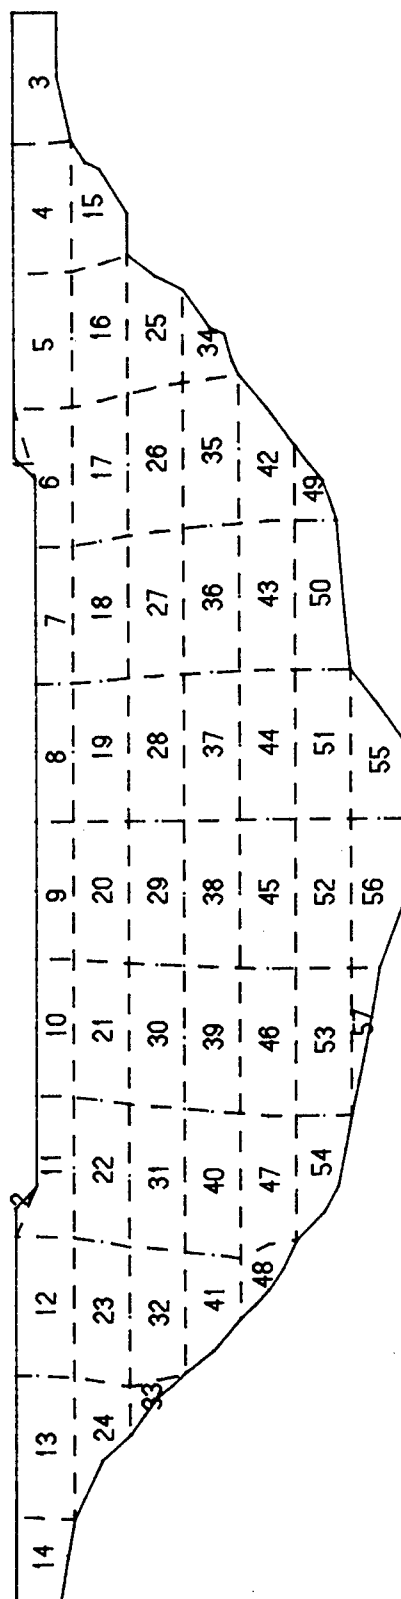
DEVELOPED VIEW OF UPSTREAM FACE, LOOKING DOWNSTREAM
